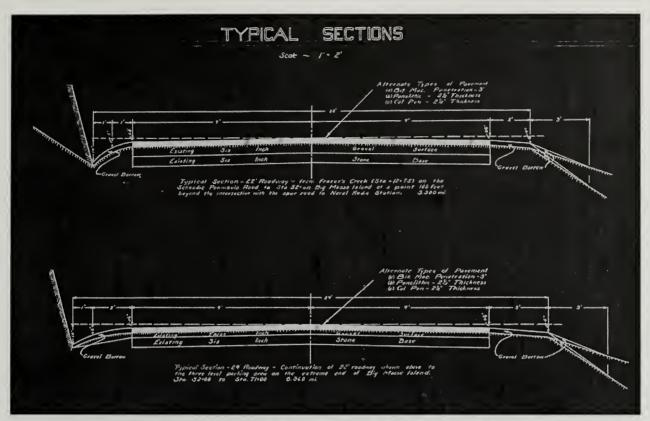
Cross-section diagram for Schoodic Loop Road and Schoodic Point Road, 1934. The top diagram represents a 22-foot crosssection for Schoodic Loop Road from Frazer Creek to the entrance to the radio station on Schoodic Point Road. The section includes an 18-foot traveled way, 1-foot shoulder in cut, and 2-foot shoulder in fill. The bottom diagram represents a 24-foot cross-section of Schoodic Point Road from the radio station entrance to the parking lot. The section includes an 18-foot traveled way, 2-foot shoulder in cut and 3' shoulder in fill. (U.S. Department of Agriculture, Bureau of Public Roads, Project 2A4, 1934)
